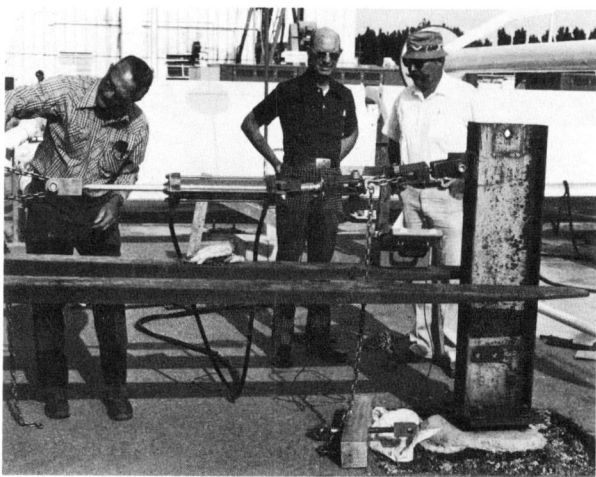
Parabolic Trough Foundations Undergoing Structural Load Tests
